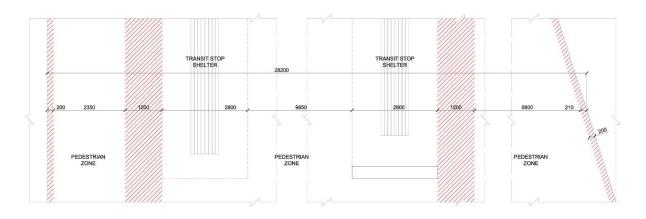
Street width and buffer spaces (in mm) for Gateway 8 in the area surrounding Darmstadt Hauptbahnhof
